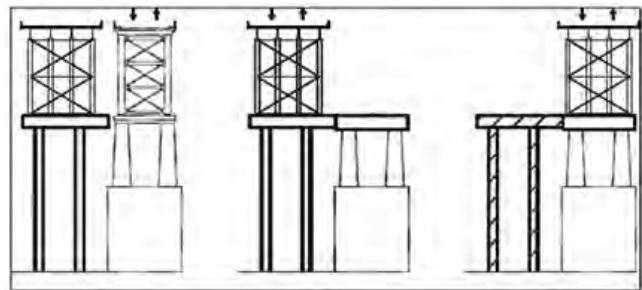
Original staging plan for hurricane deck bridge (MoDOT 2011).
